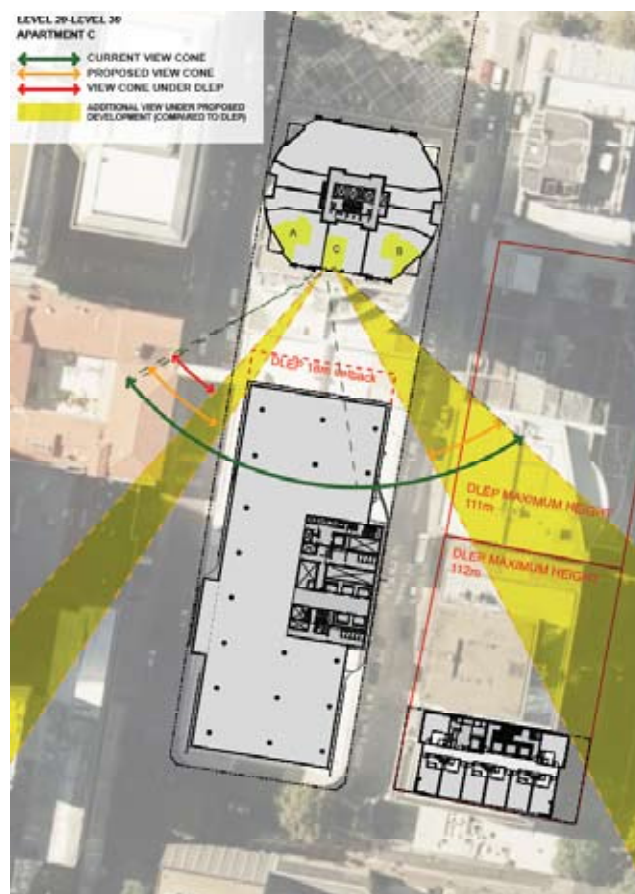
Additional view corridors preserved by proposed building envelope to the south
